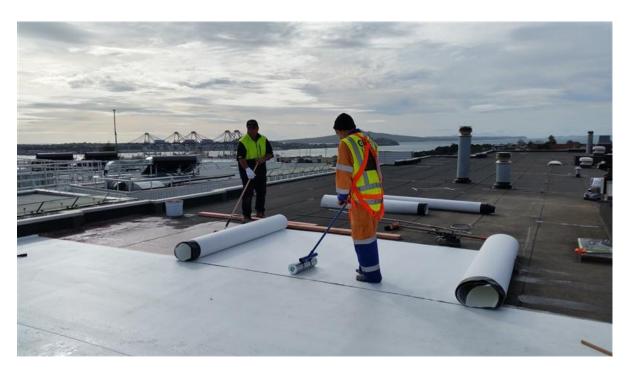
Membrane MAPEPLAN T Af on fully exposed roof
